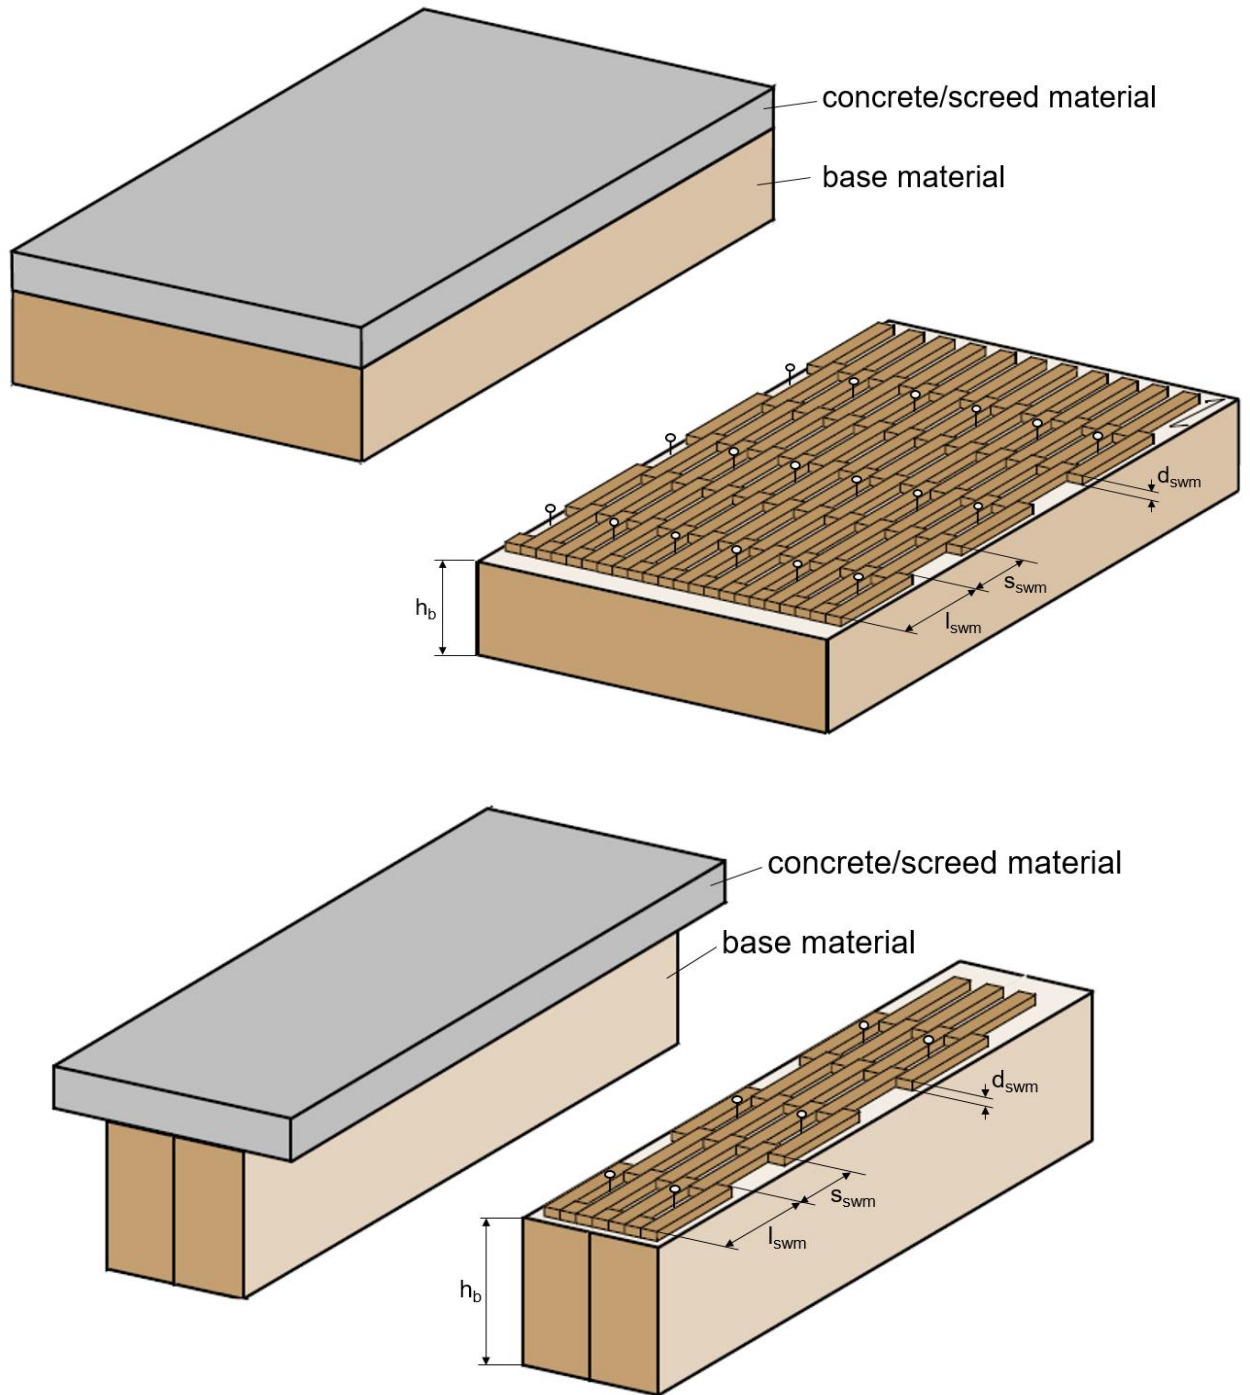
Example type 4 of wood-concrete composite slab kit
